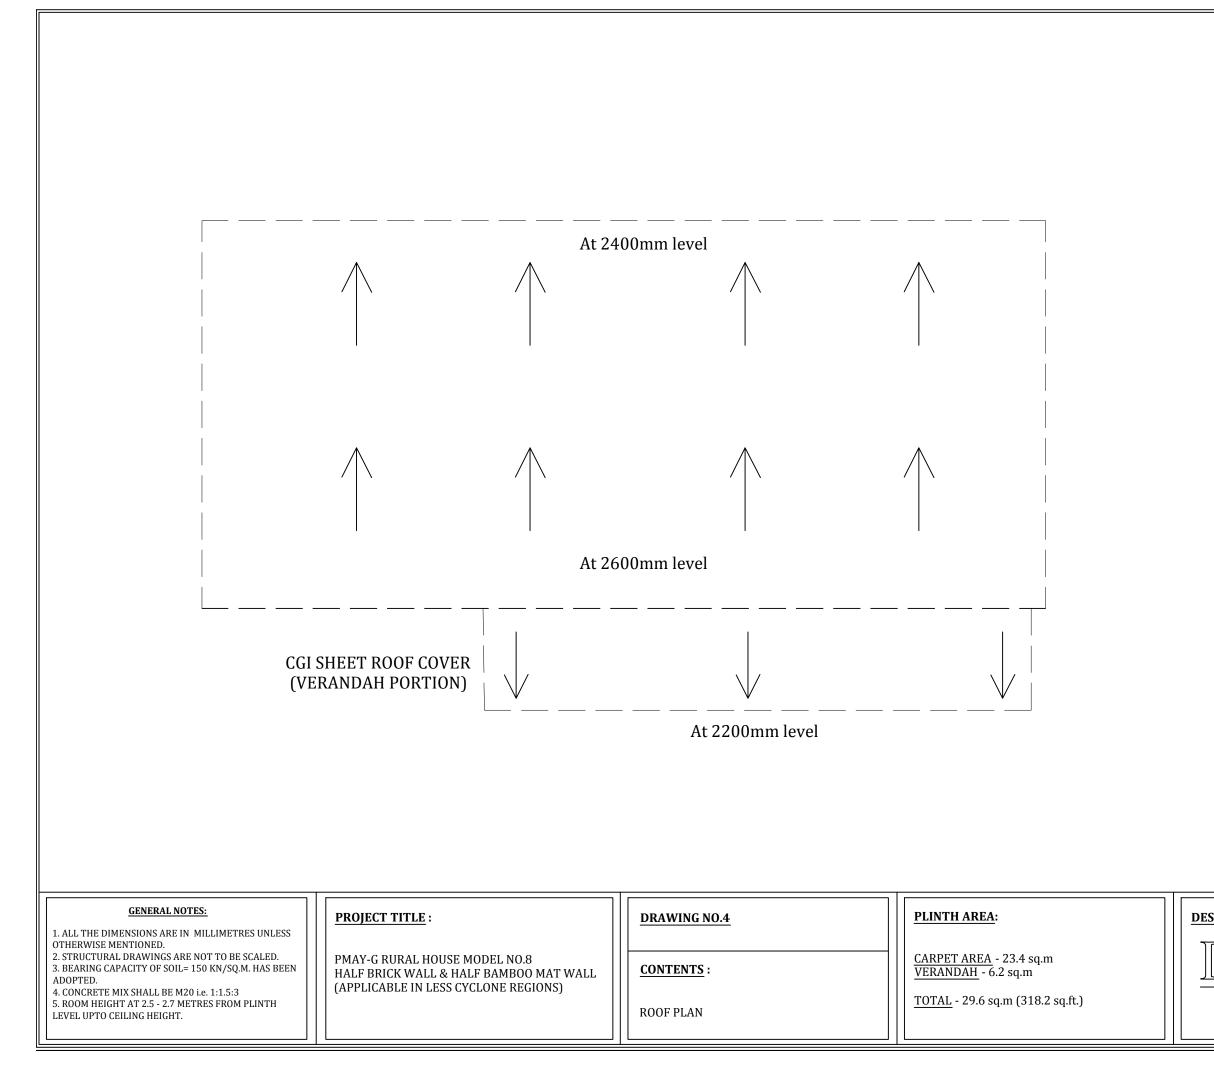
# DETAILED DRAWINGS OF PMAY-G RURAL HOUSE MODEL NO.8 HALF BRICK & HALF BAMBOO MAT WALL (APPLICABLE IN LESS CYCLONE AFFECTED REGIONS)
